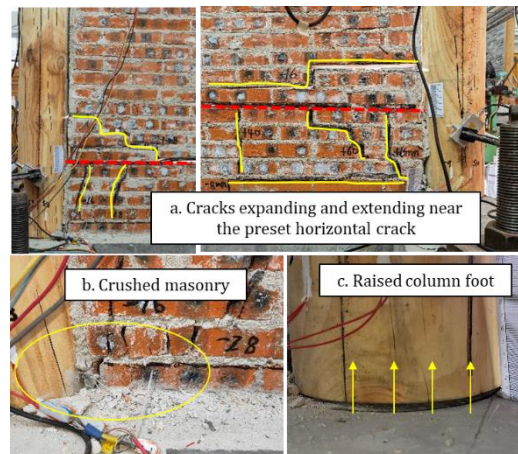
Experimental phenomena of the wall with horizontal crack in the masonry infill (specimen F4)
